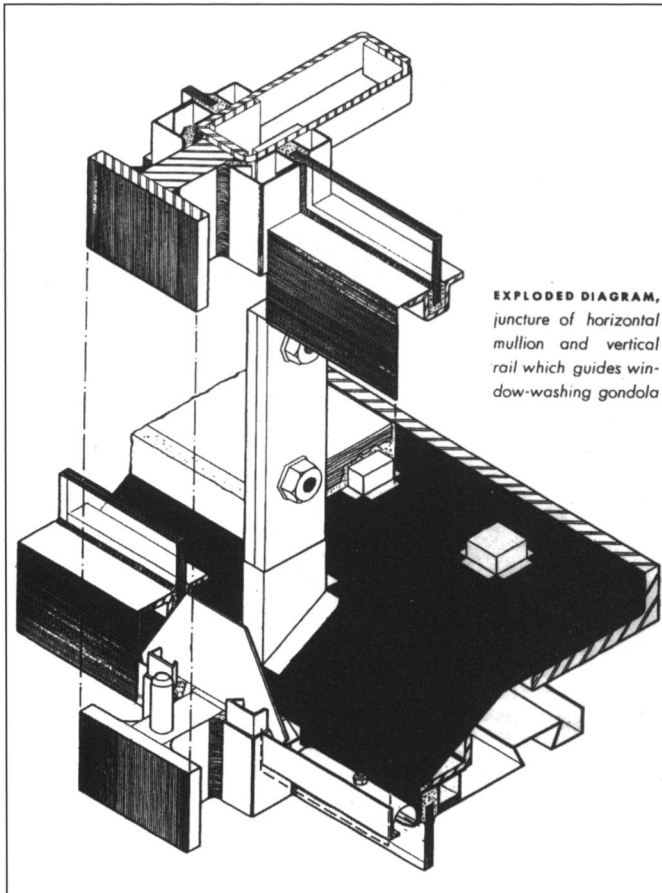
Cladding details of the Lever Building, New York, using welded mullion section (from *Architectural Record*, 1952).
